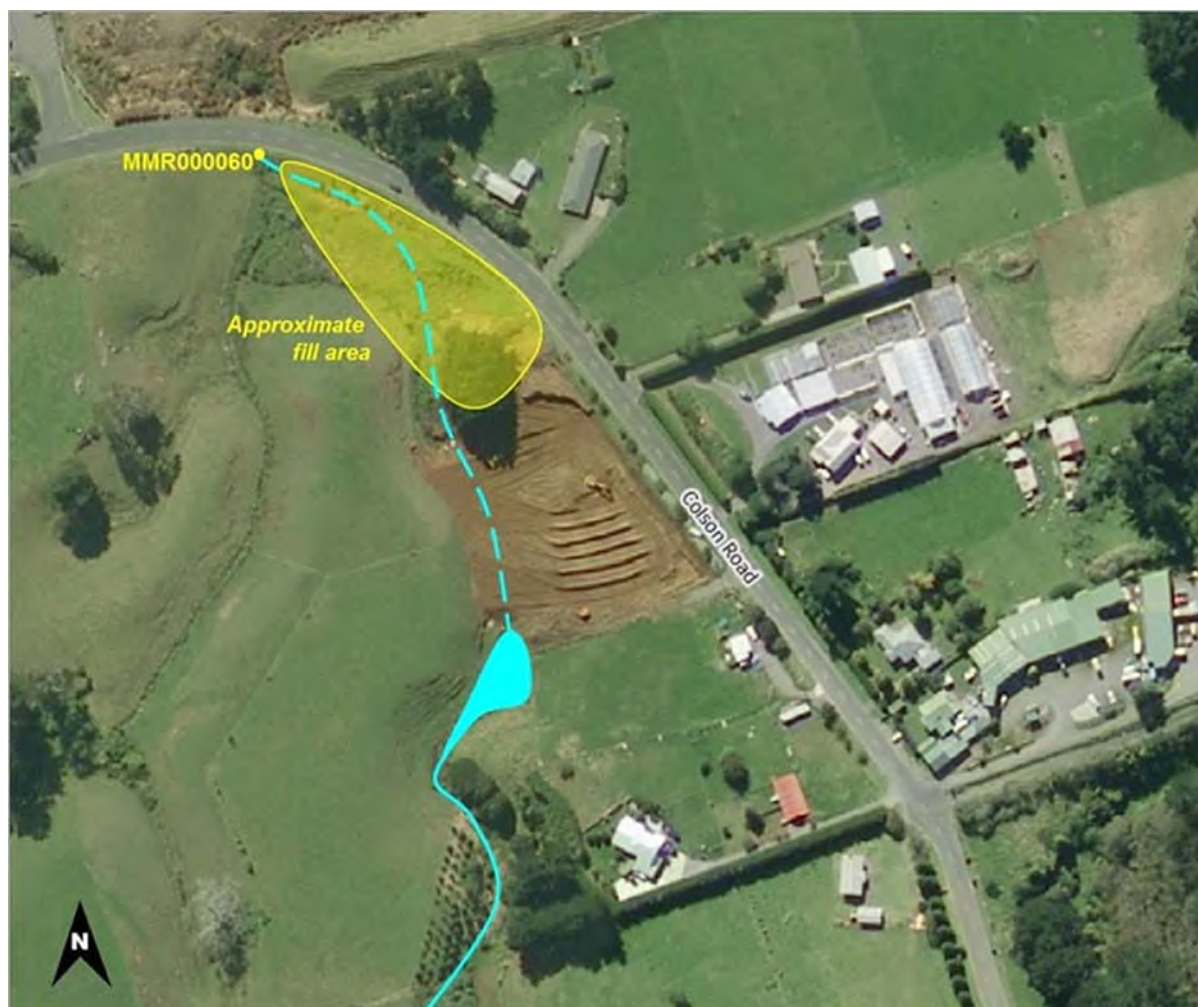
Gas and Plumbing Ltd's cleanfill and sampling site at Colson Road, New Plymouth
